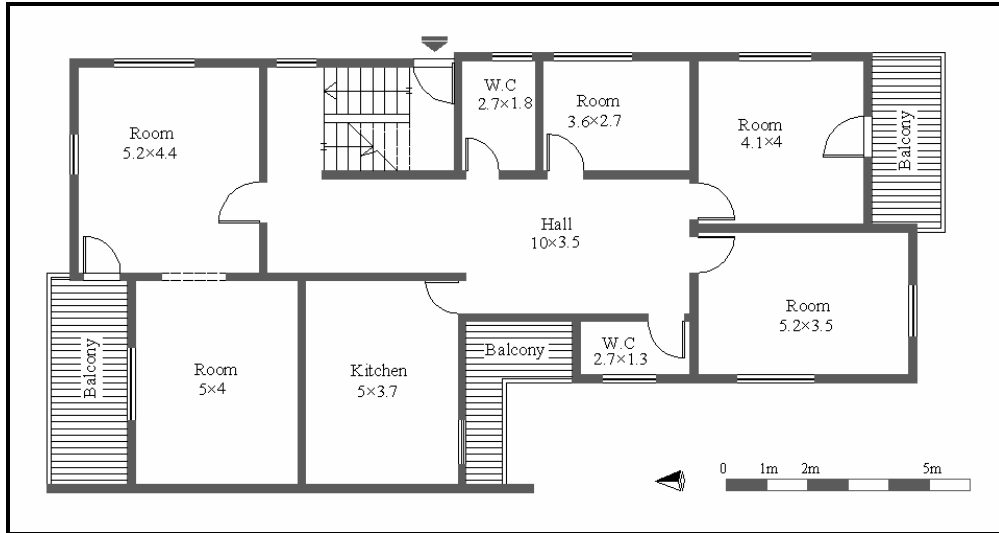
Typical floor layout of the contemporary house in Tripoli.
